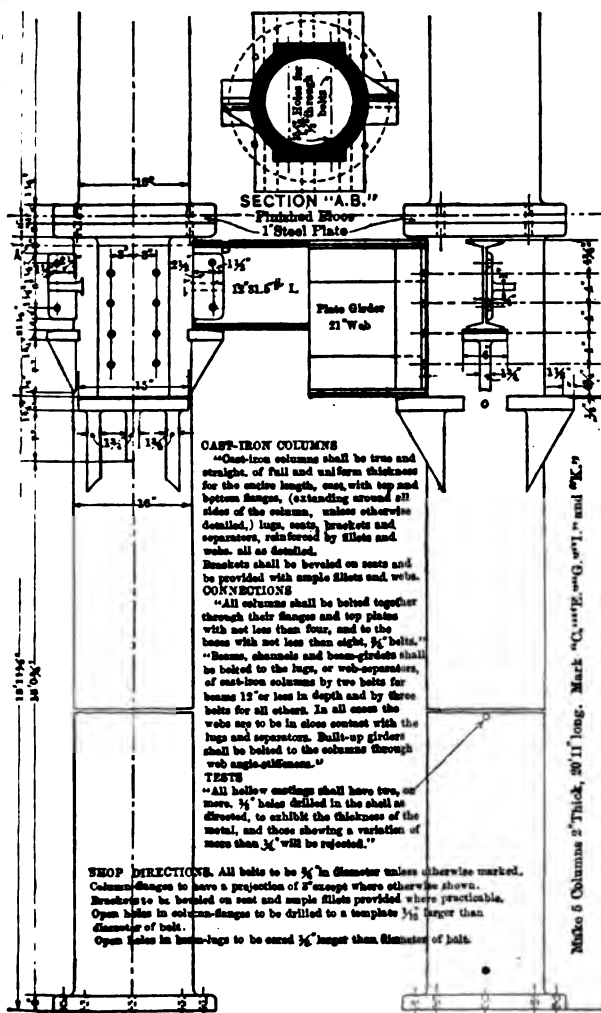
Connections for Cylindrical Cast-Iron Columns
